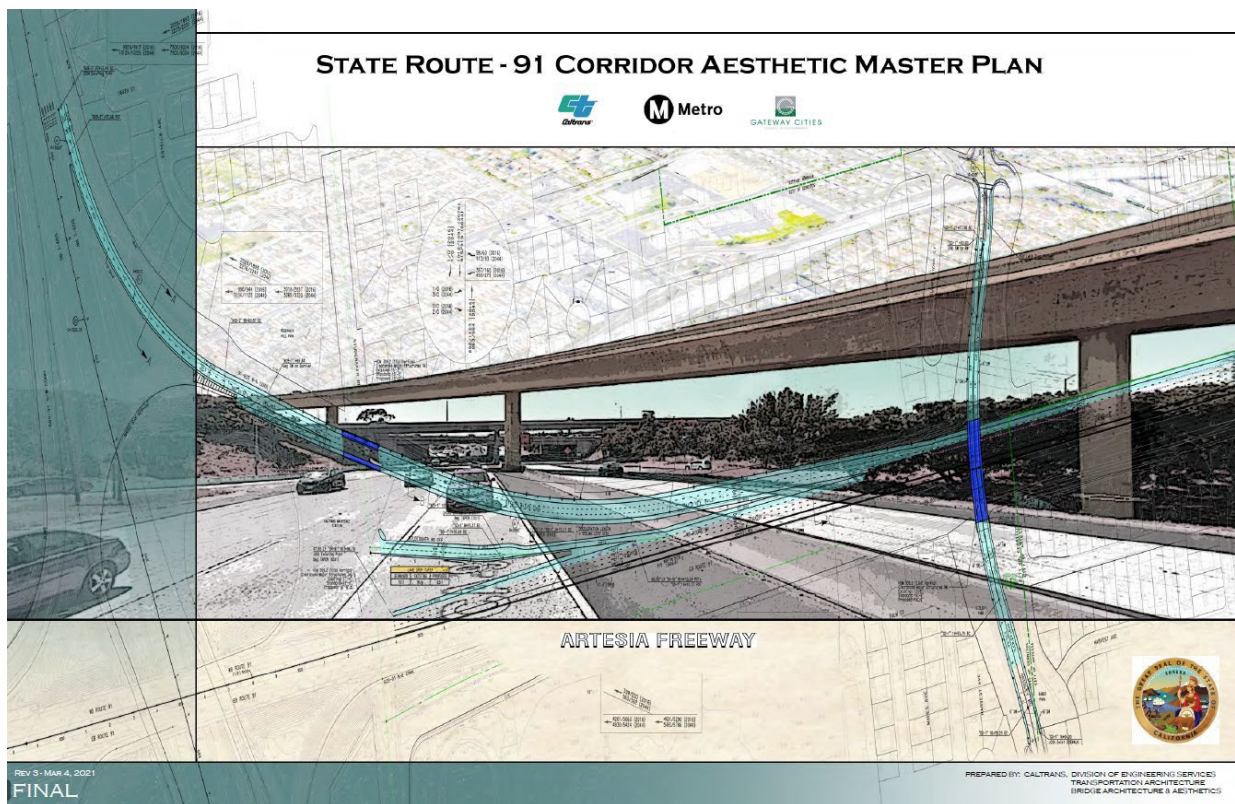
Typical Corridor Aesthetic Master Plan (cover page example)
